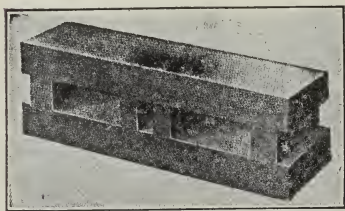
Concrete Block with Four Webs and Three Air-spaces.
